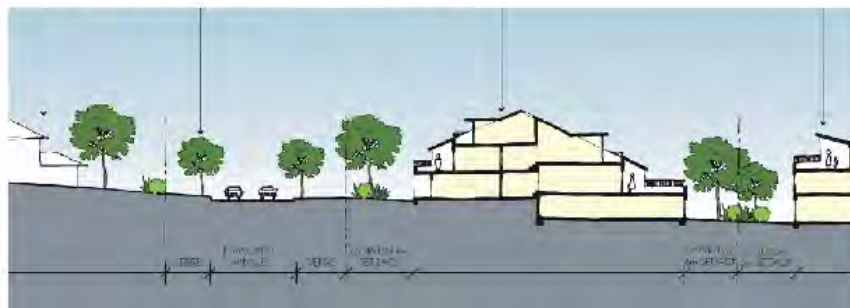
Southern part of Foamcrest Avenue, looking north
